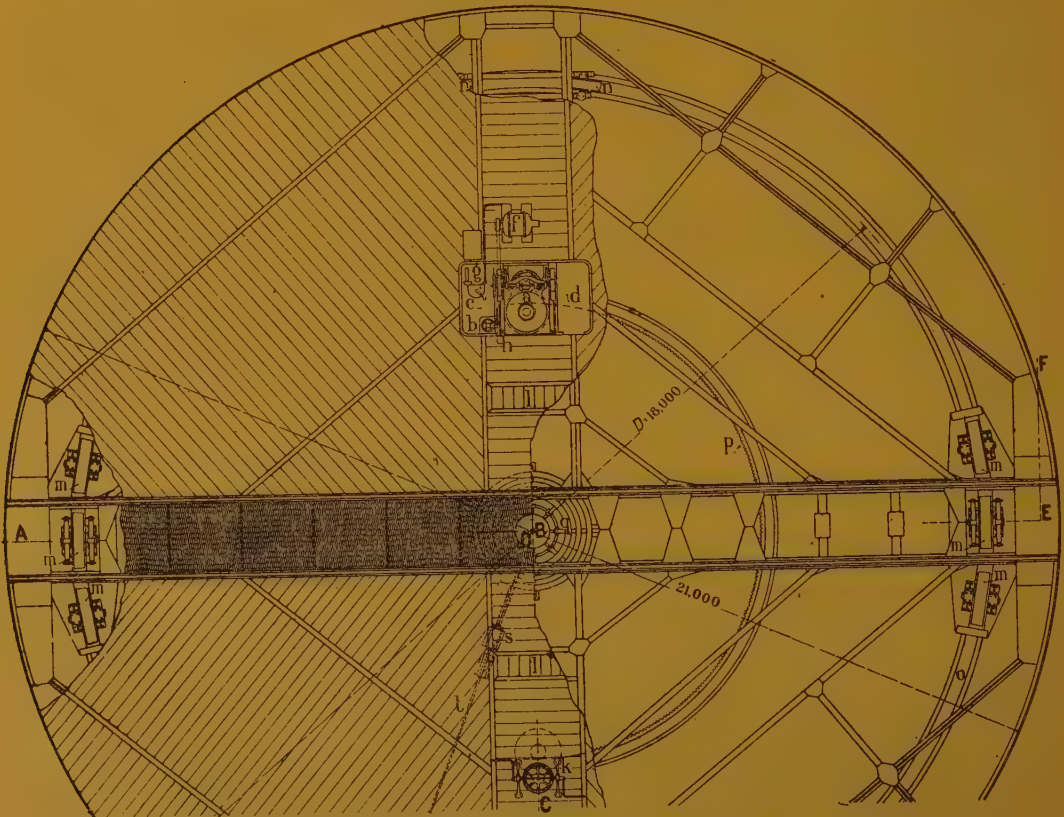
21 m. (68 ft. 10 3/4 in.) covered turntable with gear drive.
